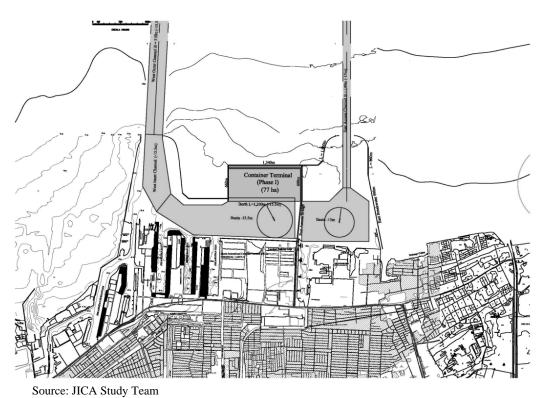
Terminal layout for North Kalibaru (Alternative 2)
